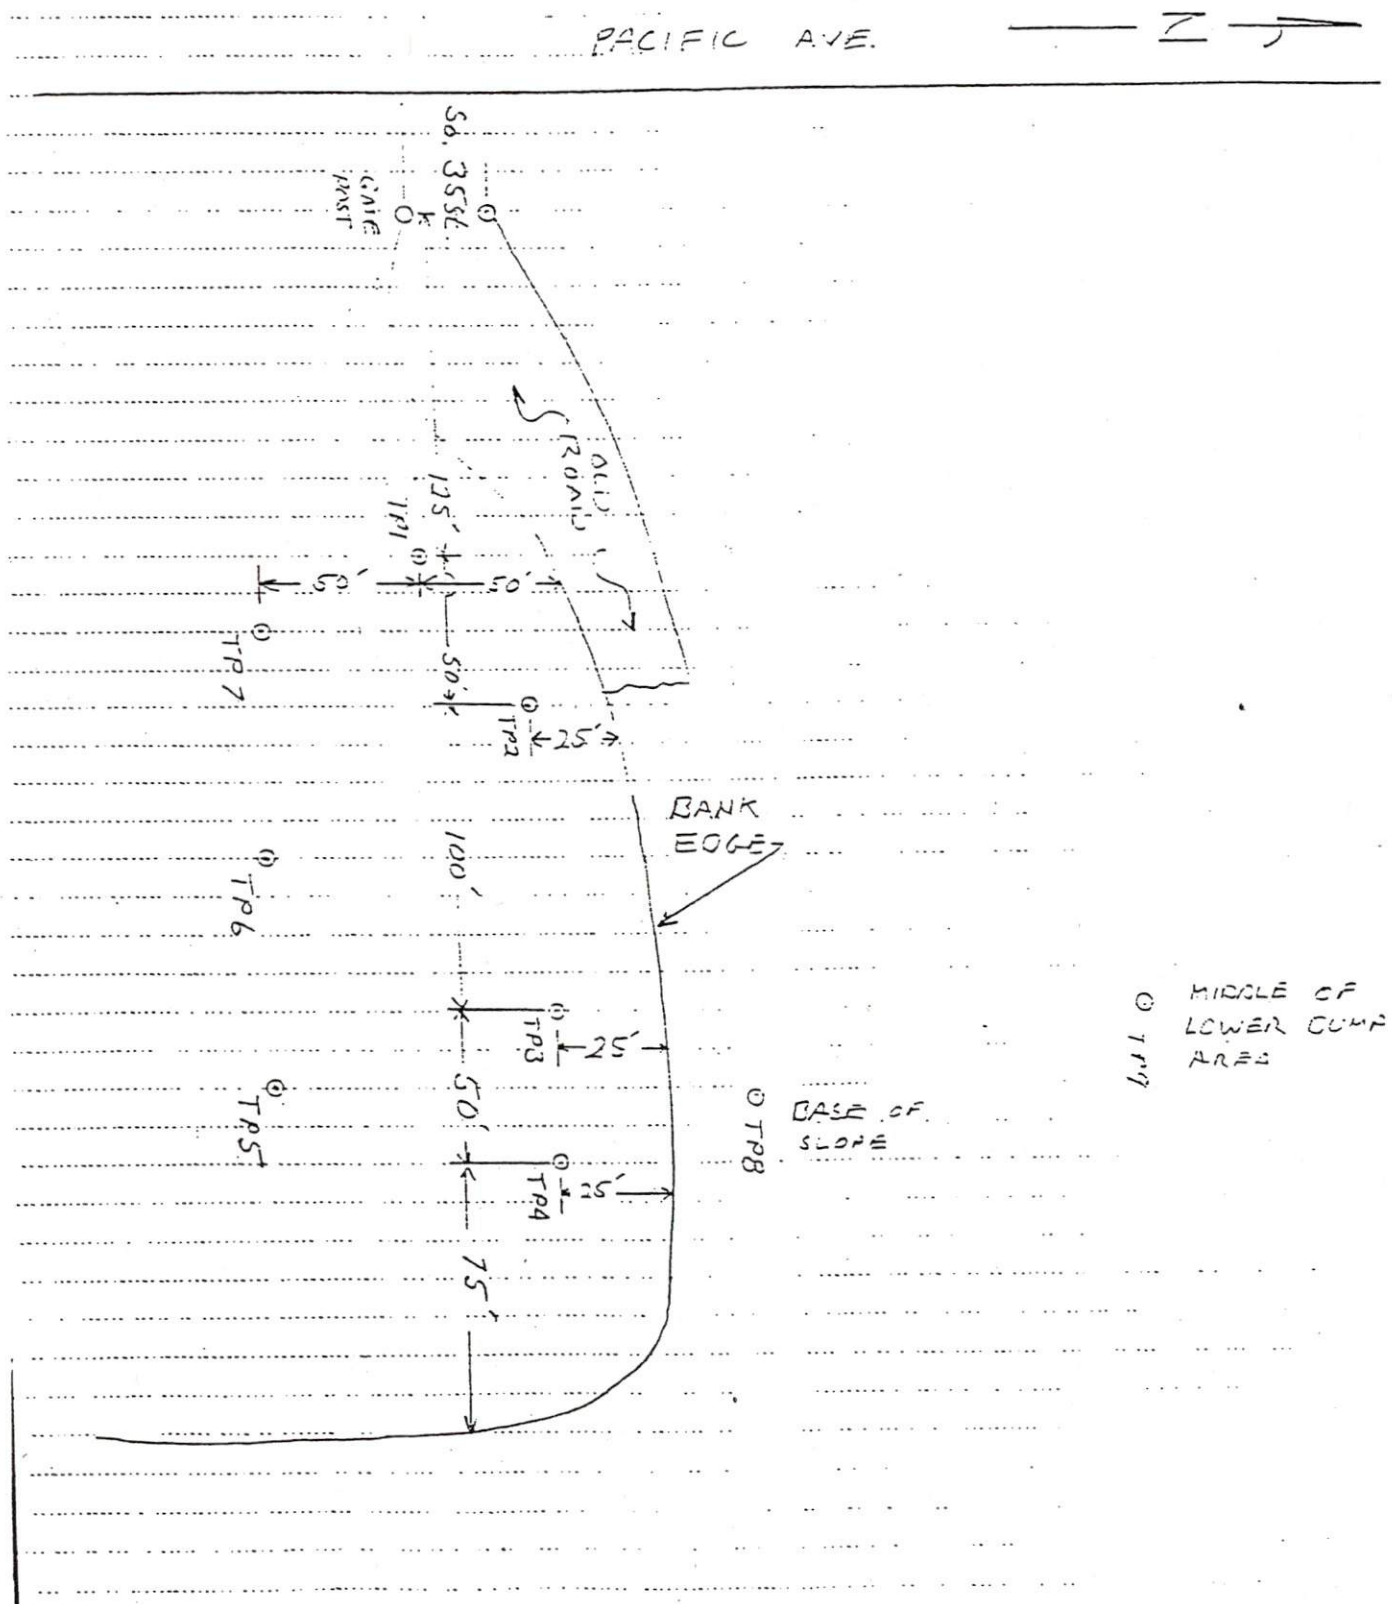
TEST PIT LOCATION 35TH STREET GULCH
